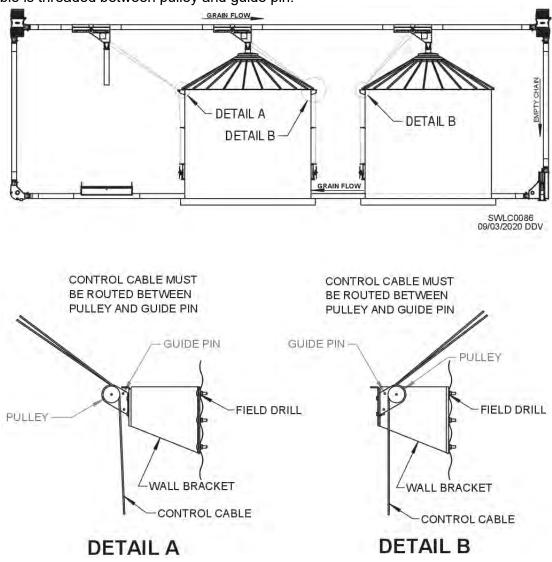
Mounting on adjacent bin (Detail A) or on same bin (Detail B)
